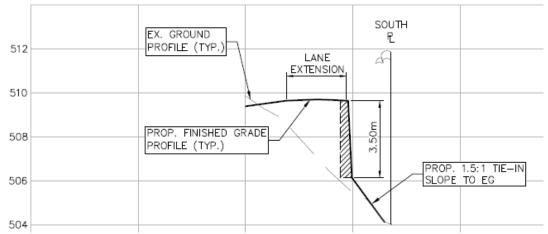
Over-height retaining wall No. 2, section drawing (green).
